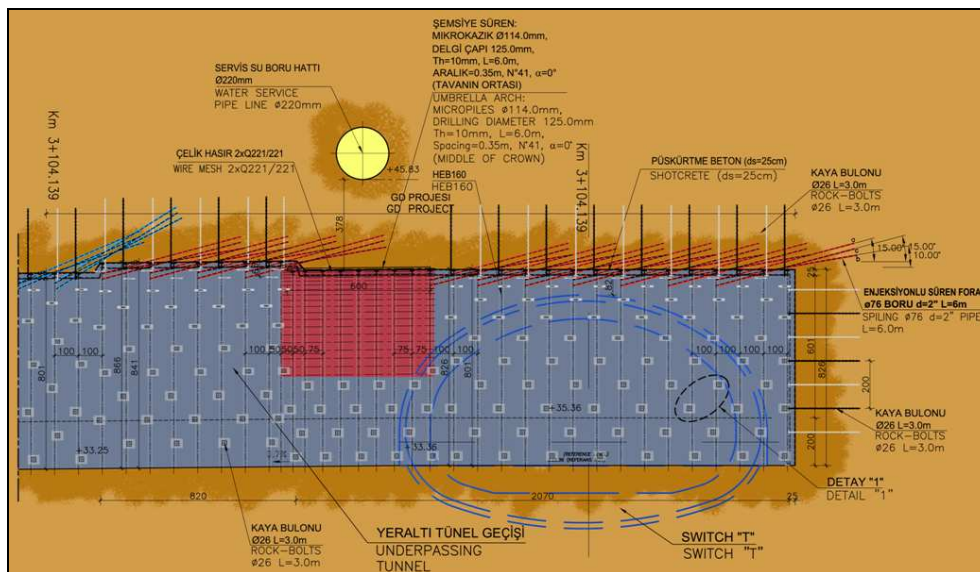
Acibadem station – Temporary support of the access tunnel - longitudinal profile.
